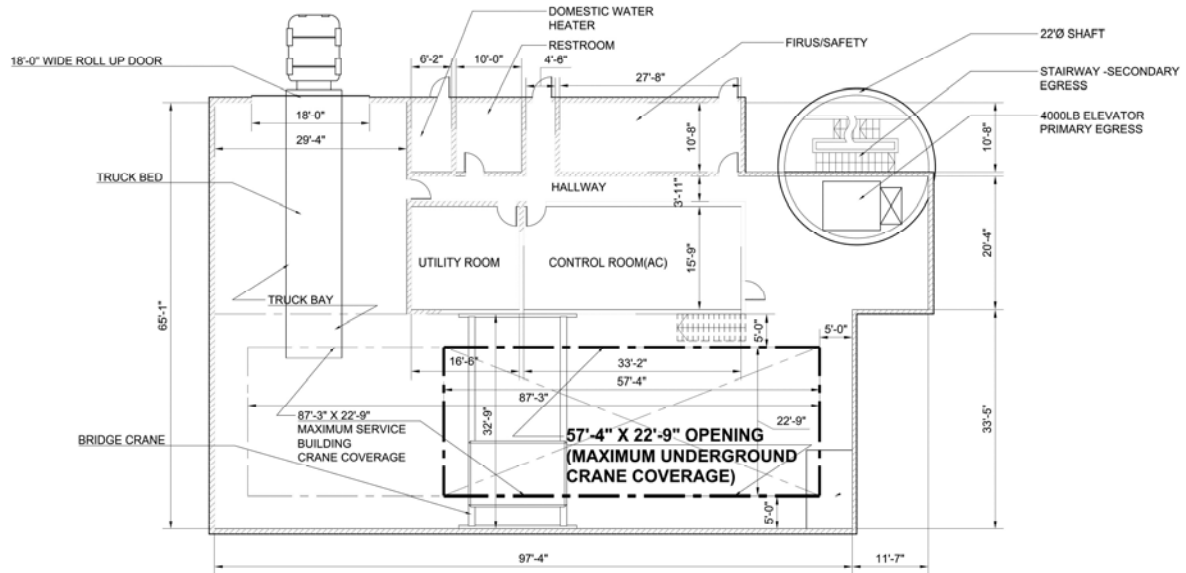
Absorber Service Building (LBNE 30) Floor Plan.
